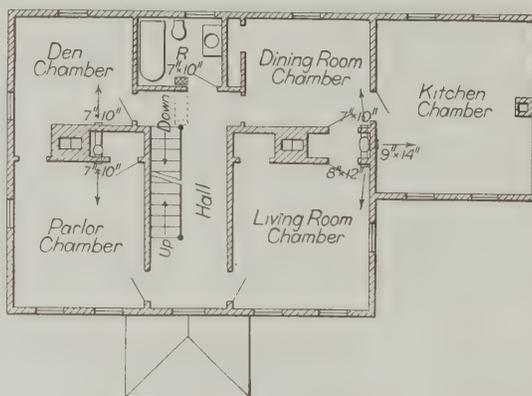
Second Floor Plan, Showing Outlets from Vertical Trunk Risers to Registers
